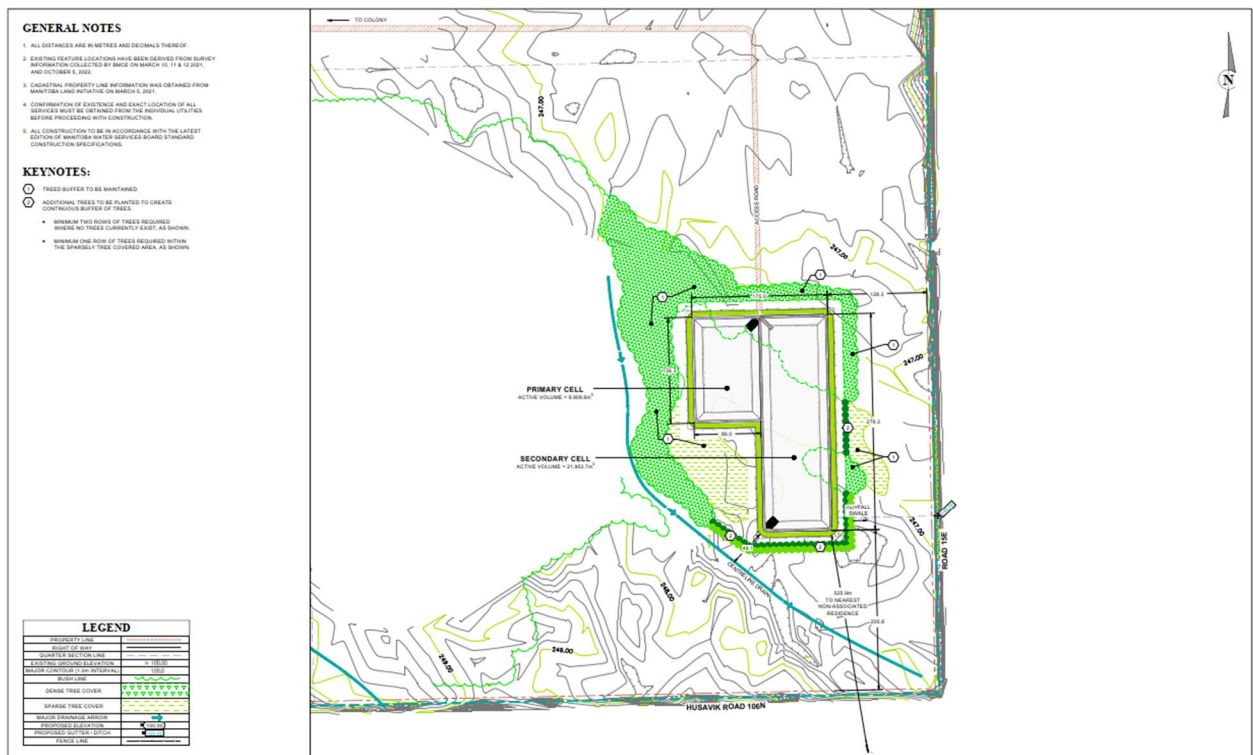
Lagoon Site Plan, Burns Maendel Consulting Engineers Ltd., 2023
